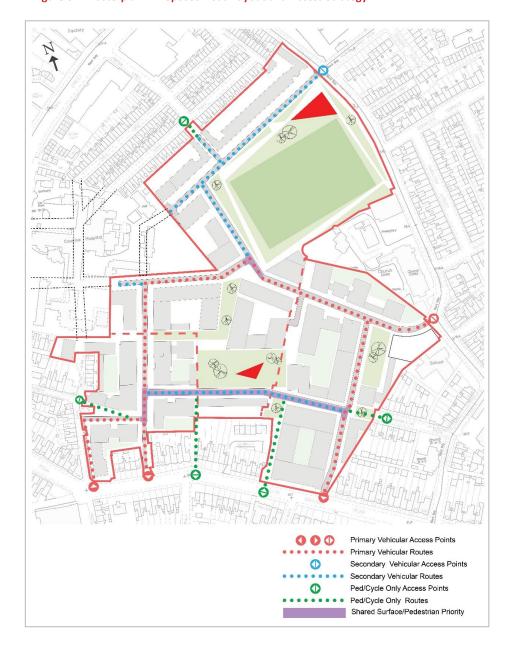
Masterplan - Proposed Road Layout and Access Strategy
